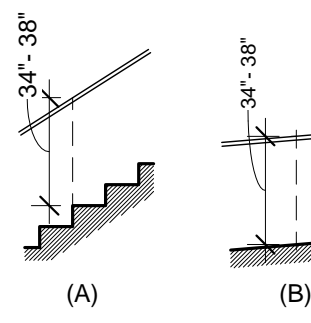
HANDRAIL HEIGHT (A) STAIRS (B) RAMPS
